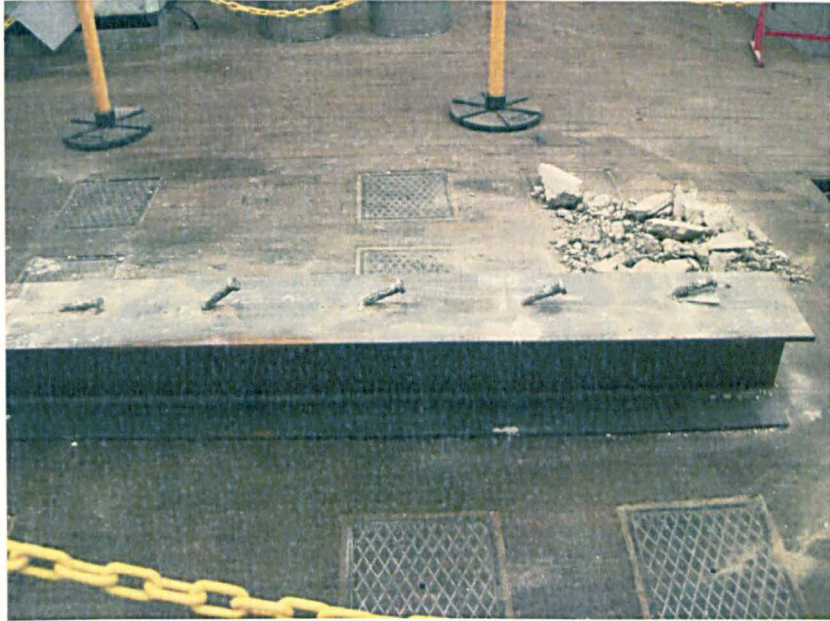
Shear studs for specimen PTSN 2-1 after failure
